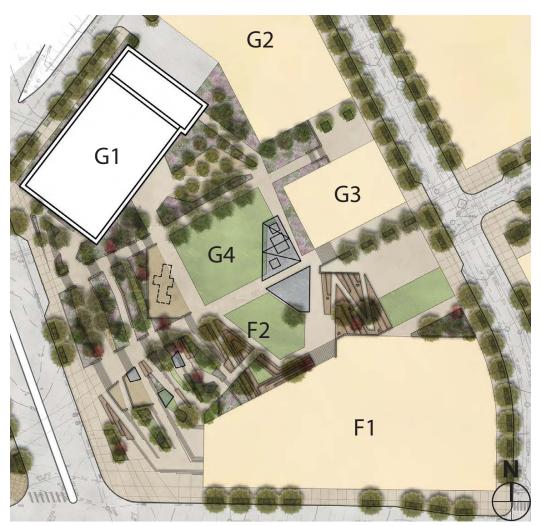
Enlarged illustrative plan showing the layout of open space in Block F and G
